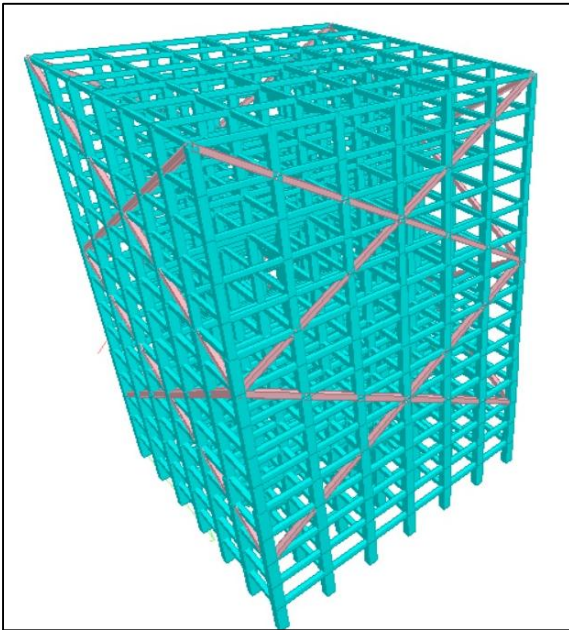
Rendered view of 15 Storey Building with Cross Bracing.
